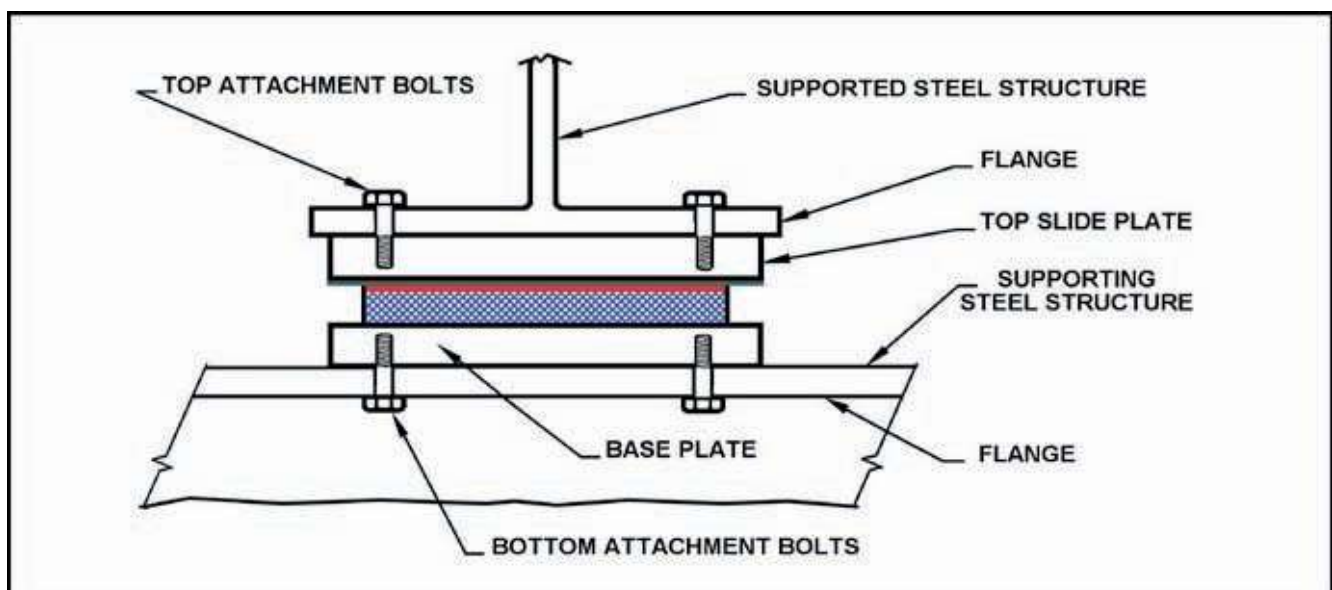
Installation of HLD/FF Bearing in a Steel Structure
